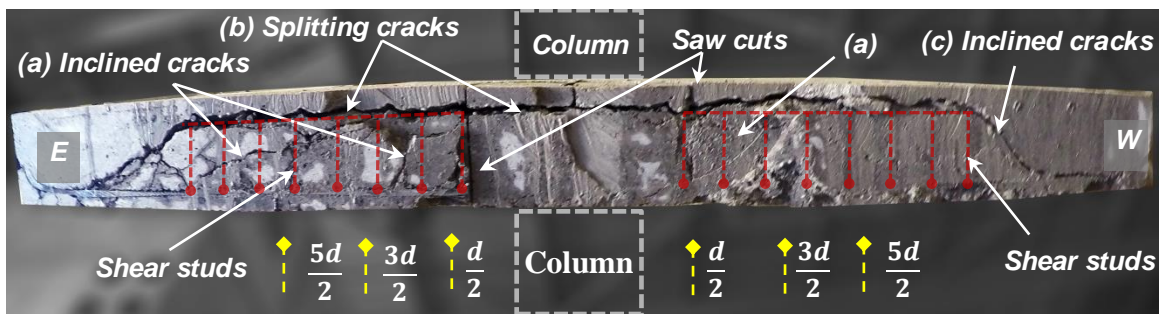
Cracks on a cut section close to the north face of the column for Specimen S080
